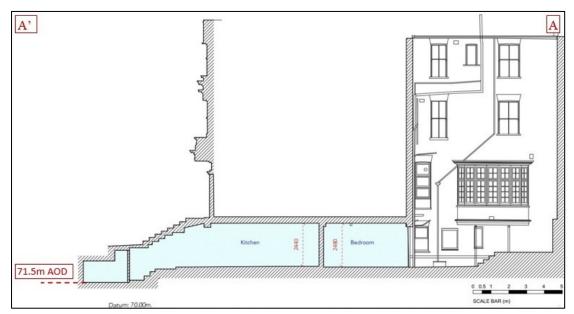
Existing Cross-Section (Extract from P-AD Architects Drawing: 7335/04 Rev B)
